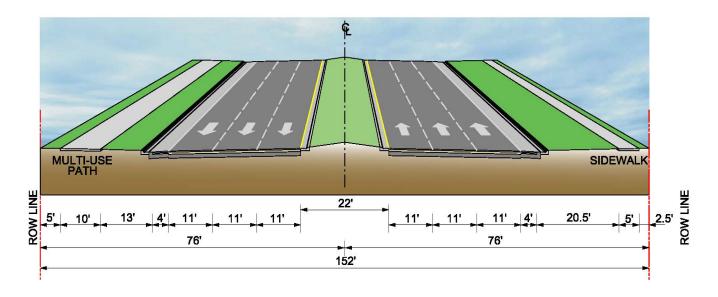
SIX-LANE DIVIDED URBAN TYPICAL SECTION FUTURE EPPERSON RANCH BOULEVARD TO PROMENADE TOWN CENTER
